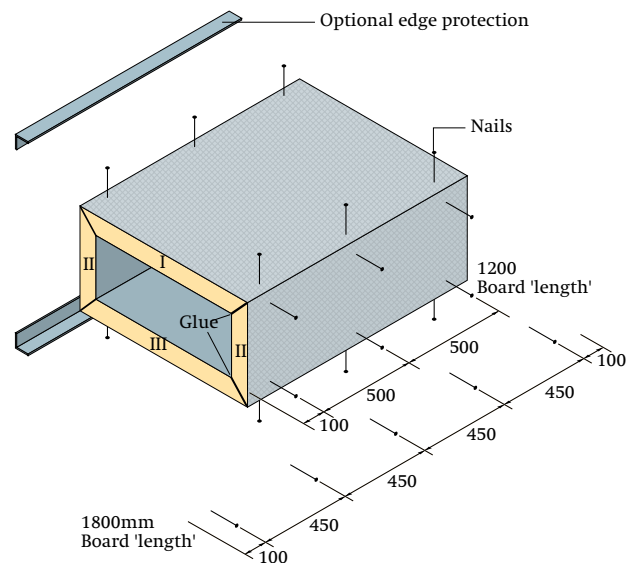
Rectangular ducts – 45° mitre joint system, showing installation sequence
